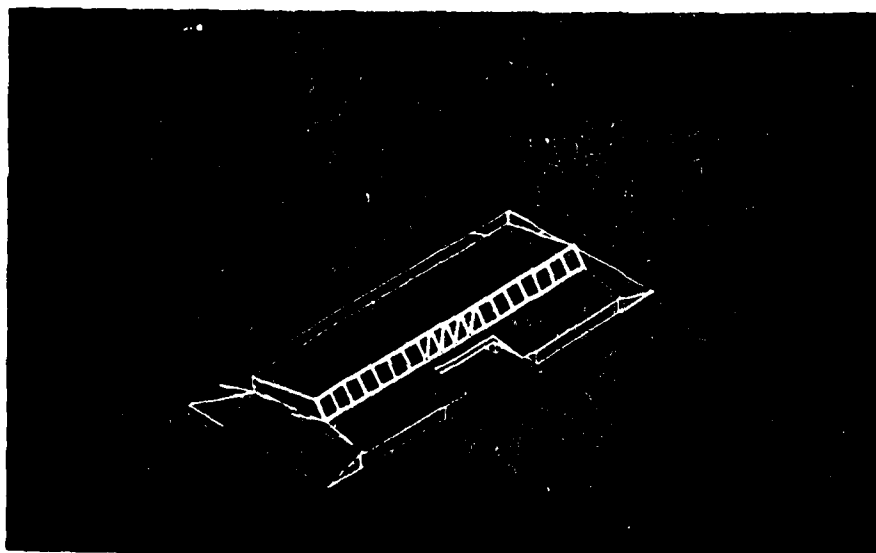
Roof is placed on building and berms are placed on north, west and east sides.
